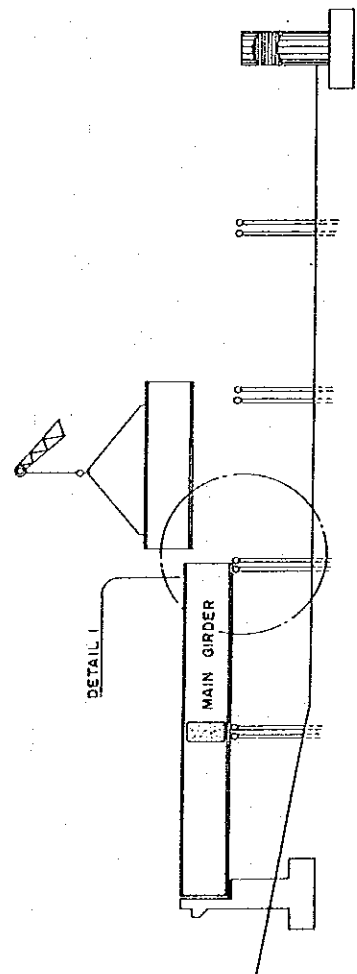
STEEL GIRDER ERECTION SCHEME
